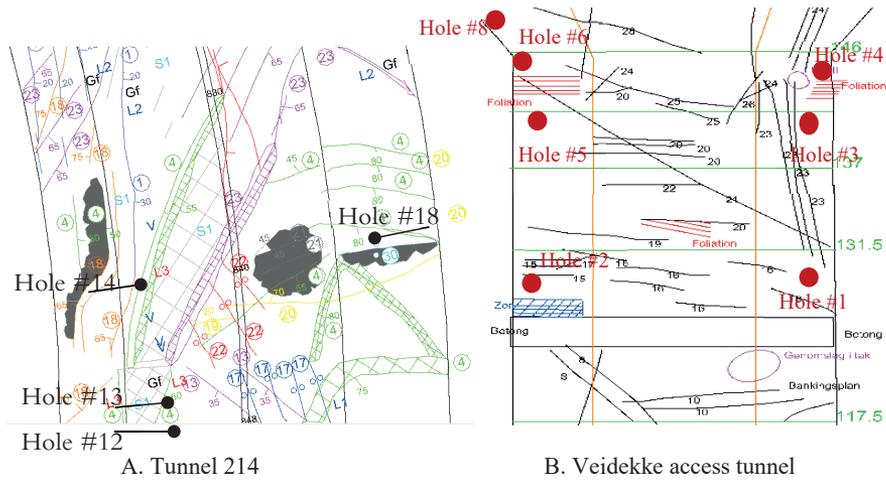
Fracture mapping and diamond core hole locations of Tunnel 214 (A) from the tunnel entrance (section 848) to 21m into the tunnel (section 827) and the drill cores taken in the Veidekke access tunnel (B) from section 117.5, 67.5m into the tunnel to the entrance to gallery at section 146, 96m into the tunnel.
